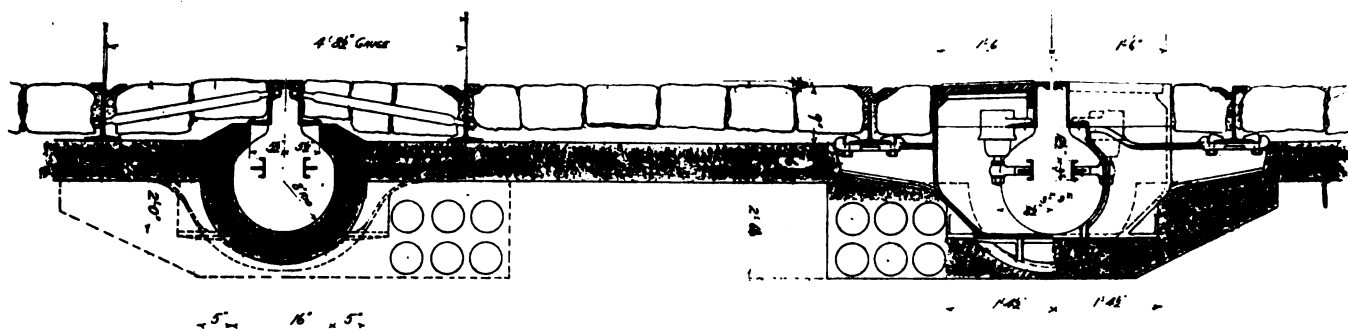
SECTION OF NEW ELECTRIC CONDUIT ROADS, NEW YORK.
